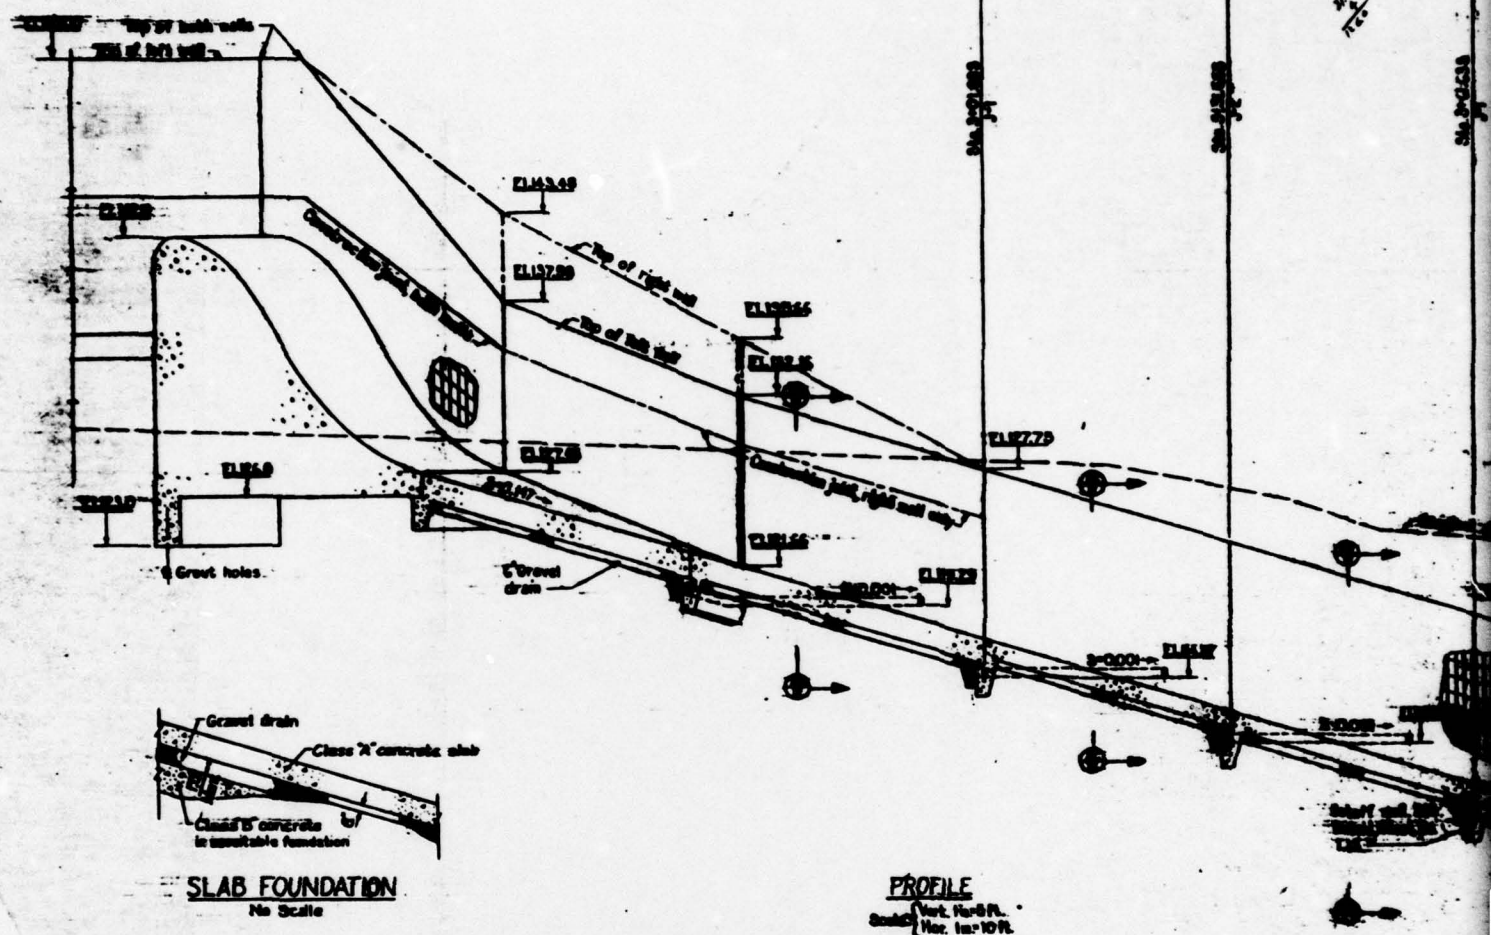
DETAILS OF INLET AND OUTLET STRUCTURE SAW MILL DAM
